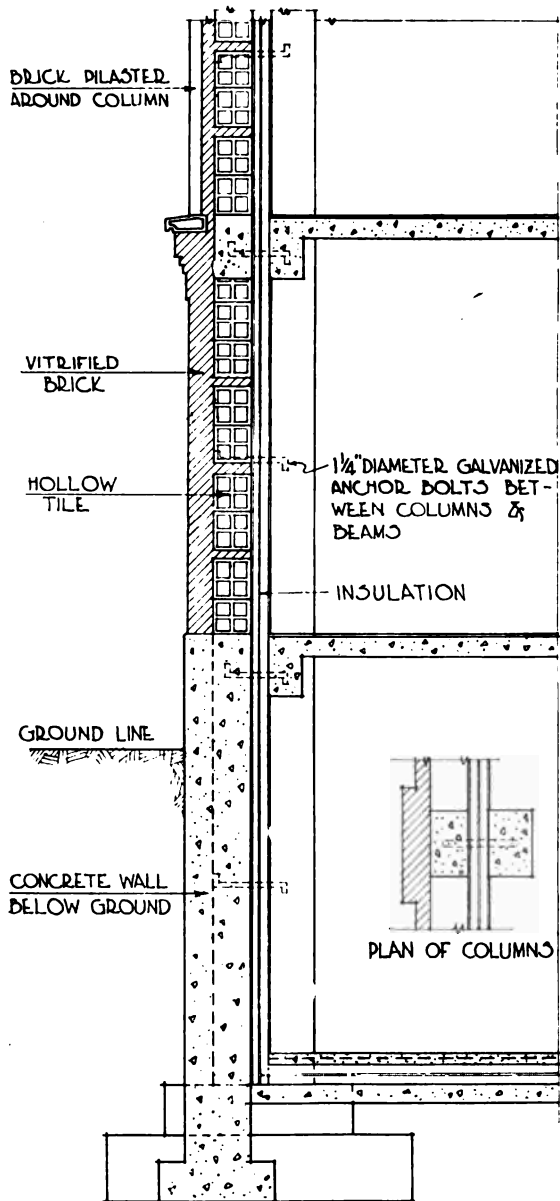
SECTION THROUGH COLD STORAGE WALLS.
